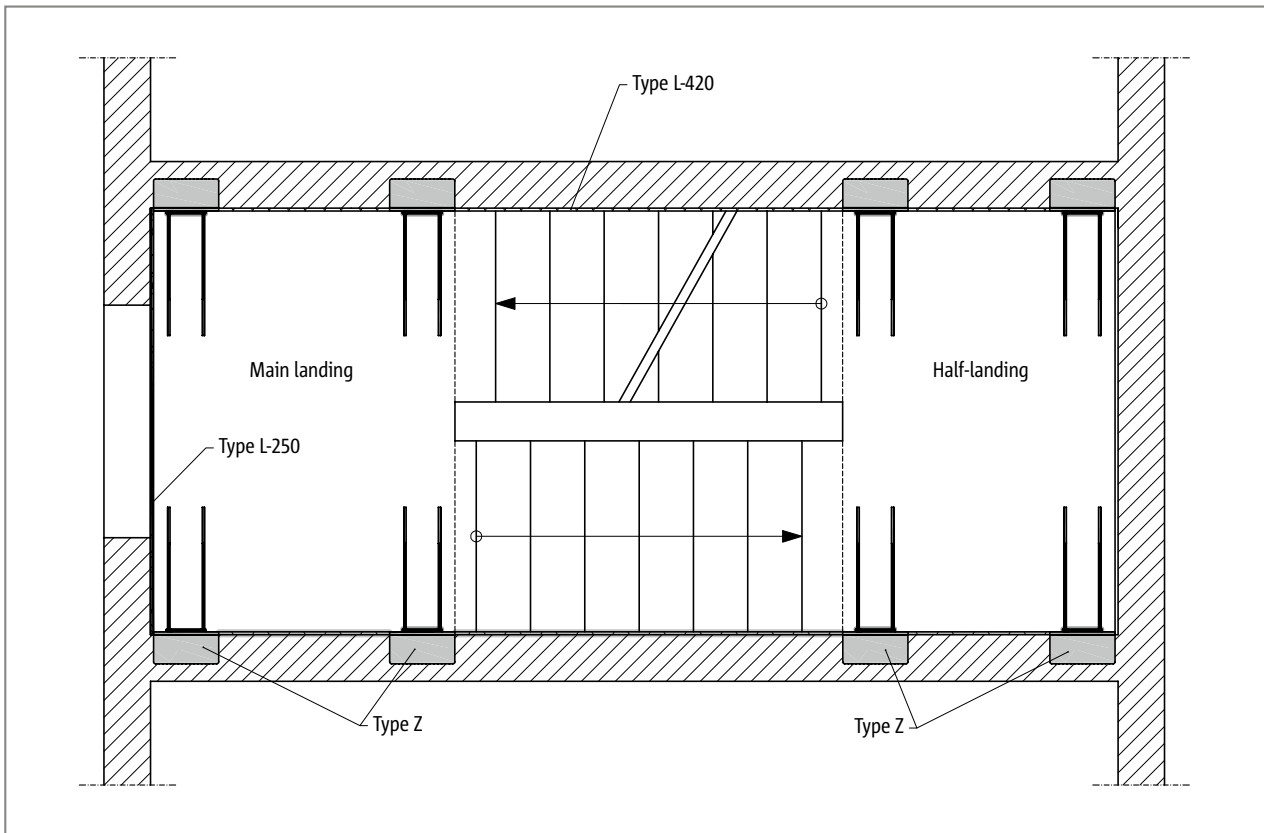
Schöck Tronsole® type Z: Element configuration in plan view
